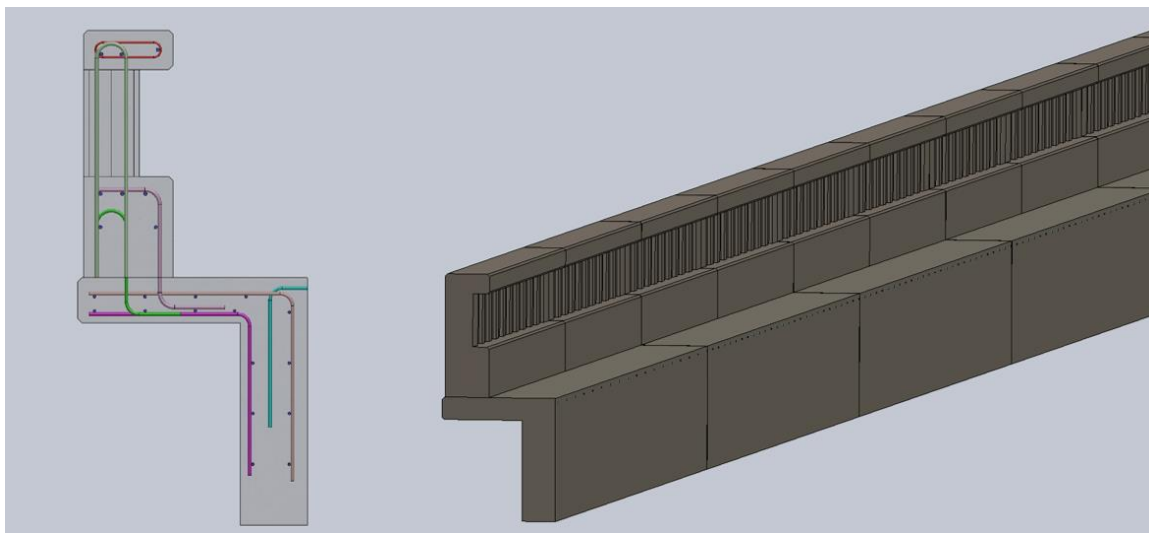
Solidworks rendering of barrier-rebar layout and isometric view of barrier attachment. (Provided by William Williams at TTI)
